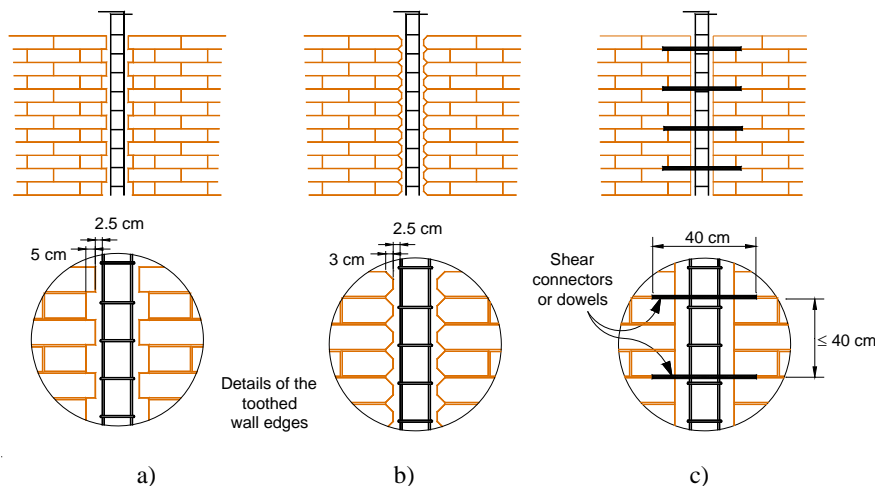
Toothing in confined masonry walls: a) machine-made hollow units, b) hand-made solid units, and c) provision of horizontal reinforcement when toothing is not possible (EERI, 2011).
